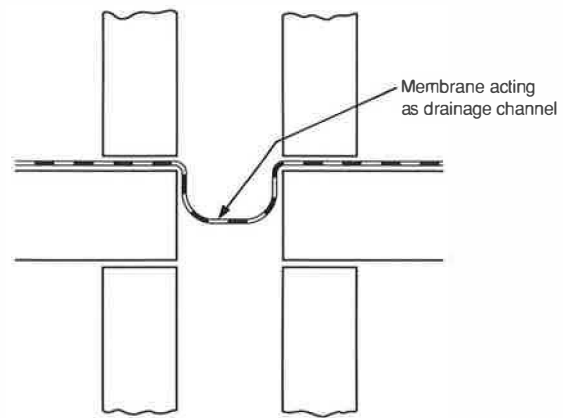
Radon-proof barrier continued across party wall and acting as drainage channel
